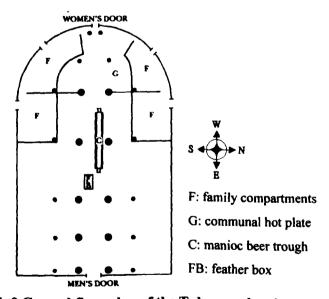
Ground floor plan of the Tukanoan longhouse.
